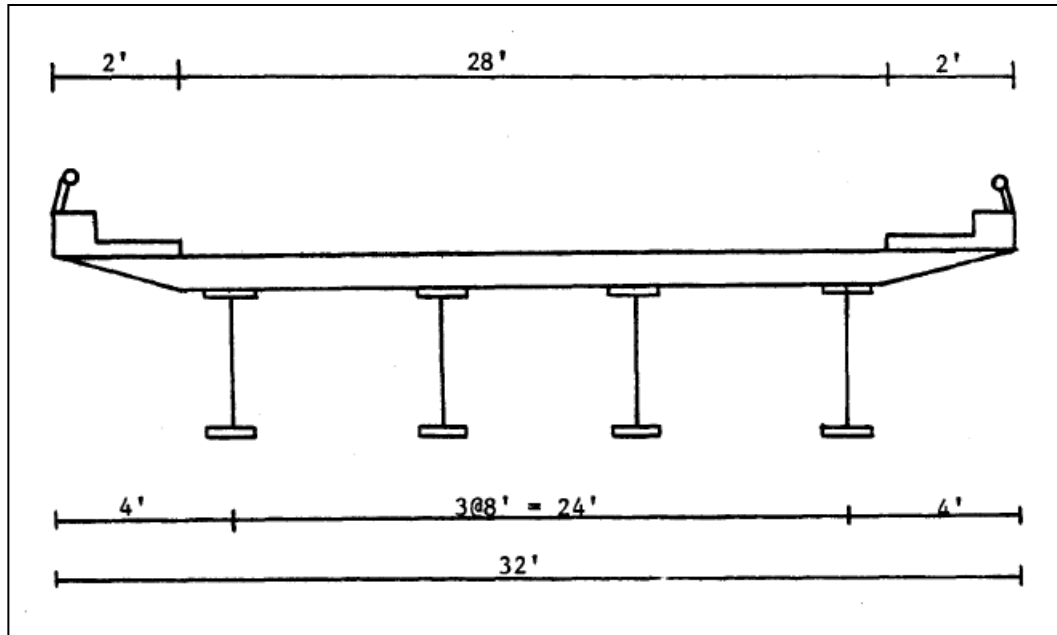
Bridge Cross-Section Assumed for Design
